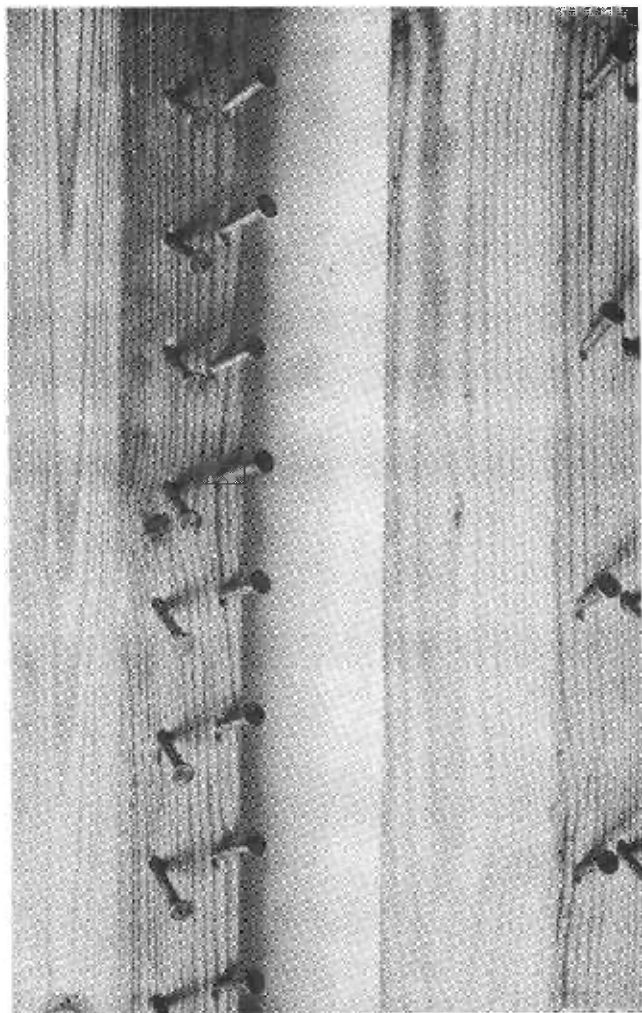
Bending of nails caused by shearing forces acting in opposite directions along studs. Right, recommended nailing on intermediate studs; left, double recommended nailing.
